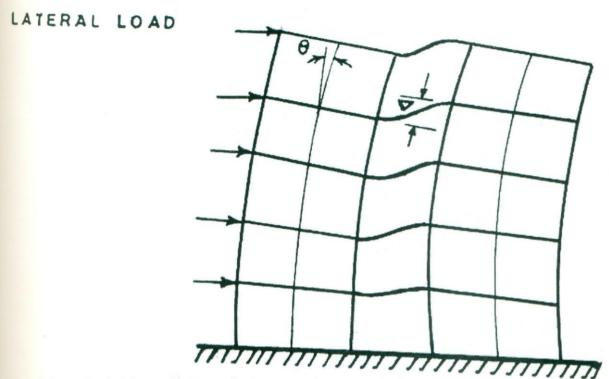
Shape of typical shear wall with coupling beams to resist transverse loads
